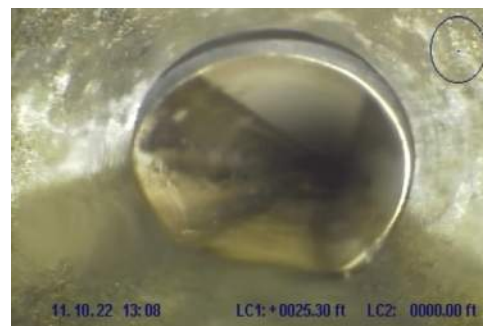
Pipe Repair in Sewer Segment on Portland Street SP00686
